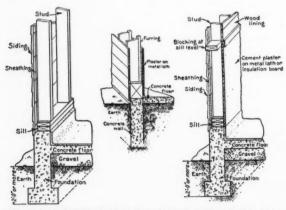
(Left) Foundation and floor construction suitable for most types of farm buildings. Fig. 2 (Center) Detail of an old barn made ratproof with concrete foundation and floor and cement-plastered walls. Fig. 3 (Right) Recommended construction of walls and floors of new frame barns. Cement plaster on metal lath or insulating board is applied to the inside of the studs, at least to the level of the window sills, as a better protection against rats
